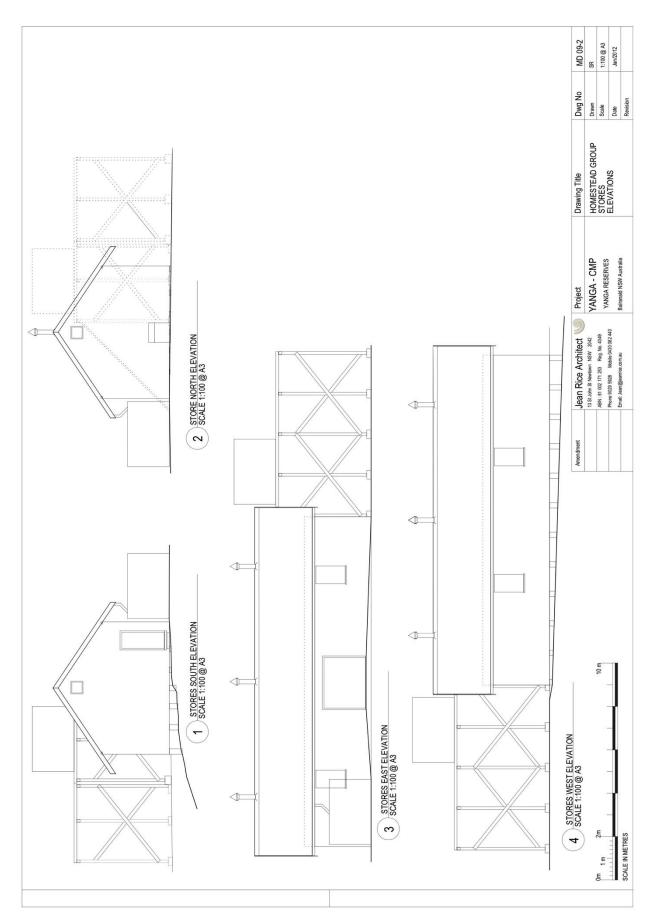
Homestead Group - Former Stores & Water tank tower elevations. Jean Rice Architect, site assessment 2009.
